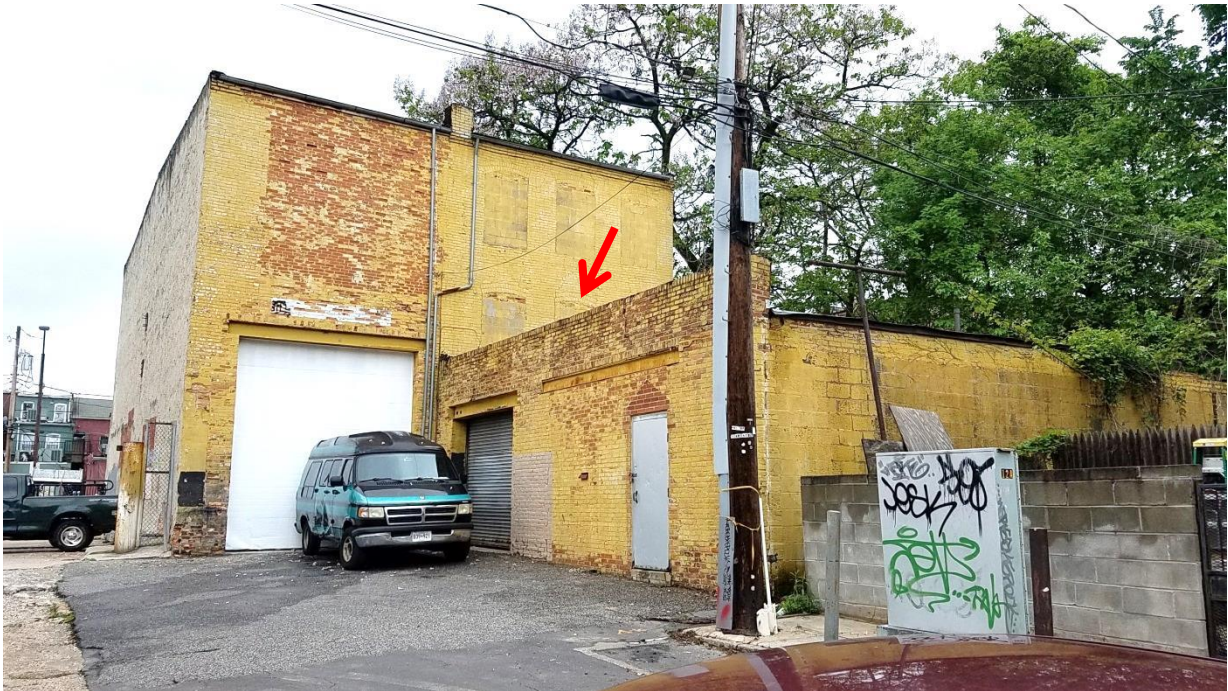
Rear of 9 S. Carlton Street and 1100 Booth Street, May 16, 2018. Arrow marks window opening to be converted to door. Other five enclosed window openings to be restored. Deck to be built on roof of one-story garage.
